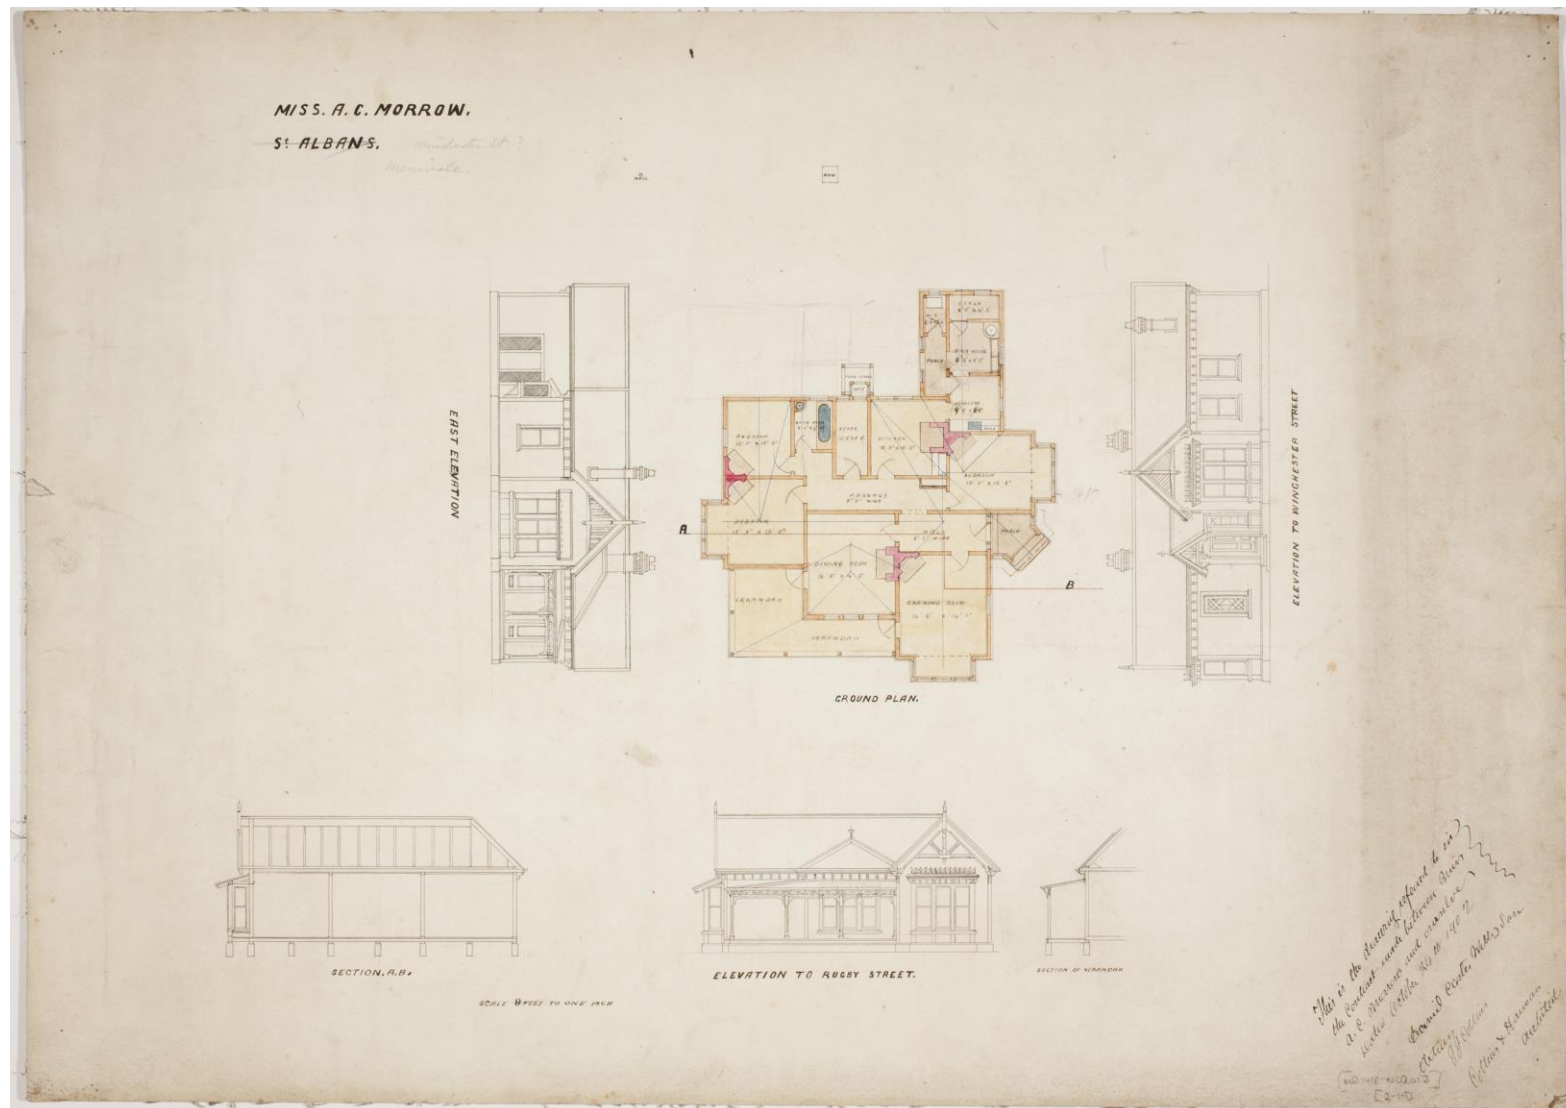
Collins and Harman, Miss A. C. Morrow, St. Albans, plan, elevations and sections (1902).
